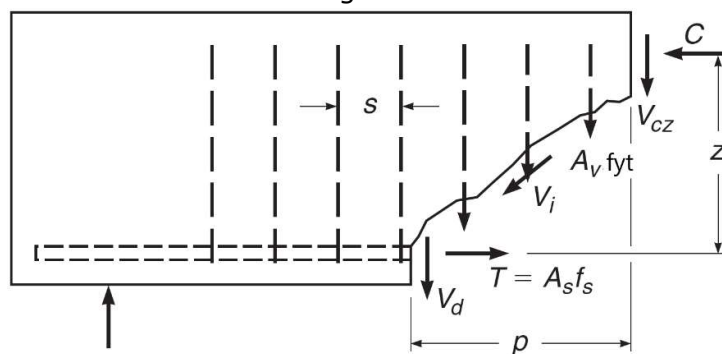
Forces at a diagonal crack in a beam with vertical stirrups, reproduced for convenience.
